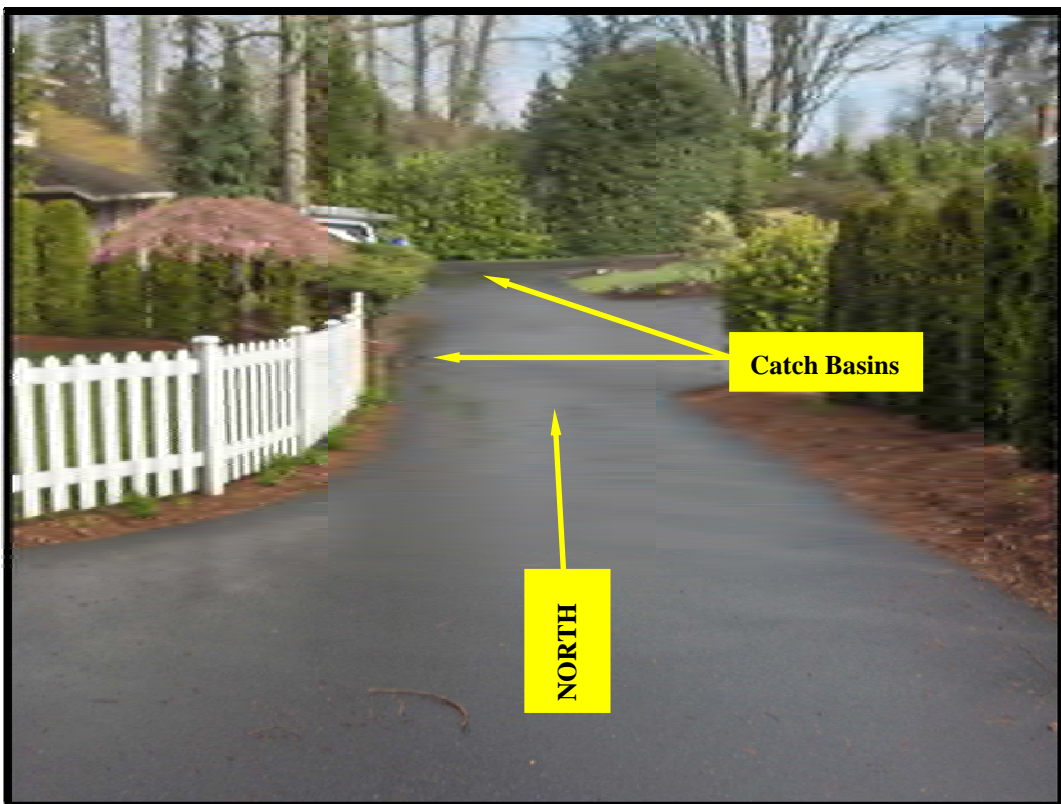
Driveway leading from 3211 – 84th Avenue SE north to Coval south property line.
